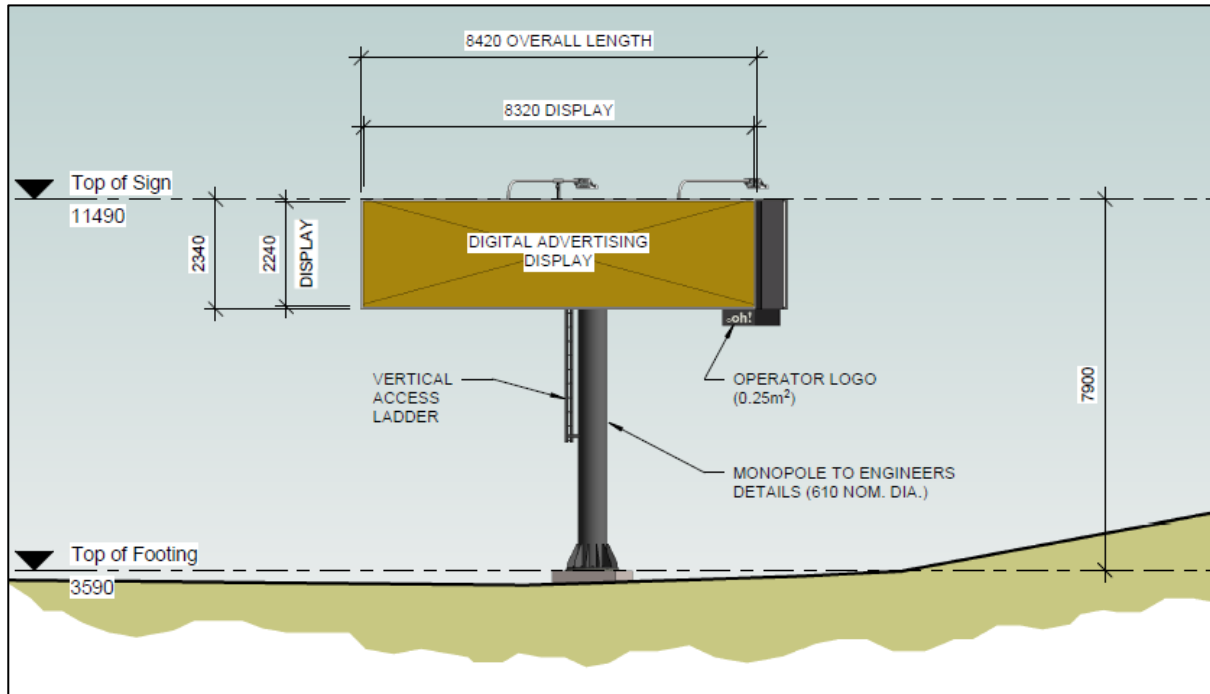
Proposed Digital Sign Elevation. Source: oOh!media
